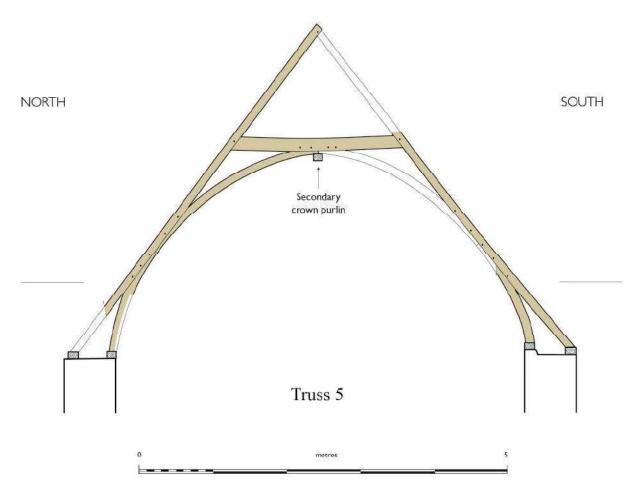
The west face of Truss 5 with surviving medieval timbers coloured brown.
